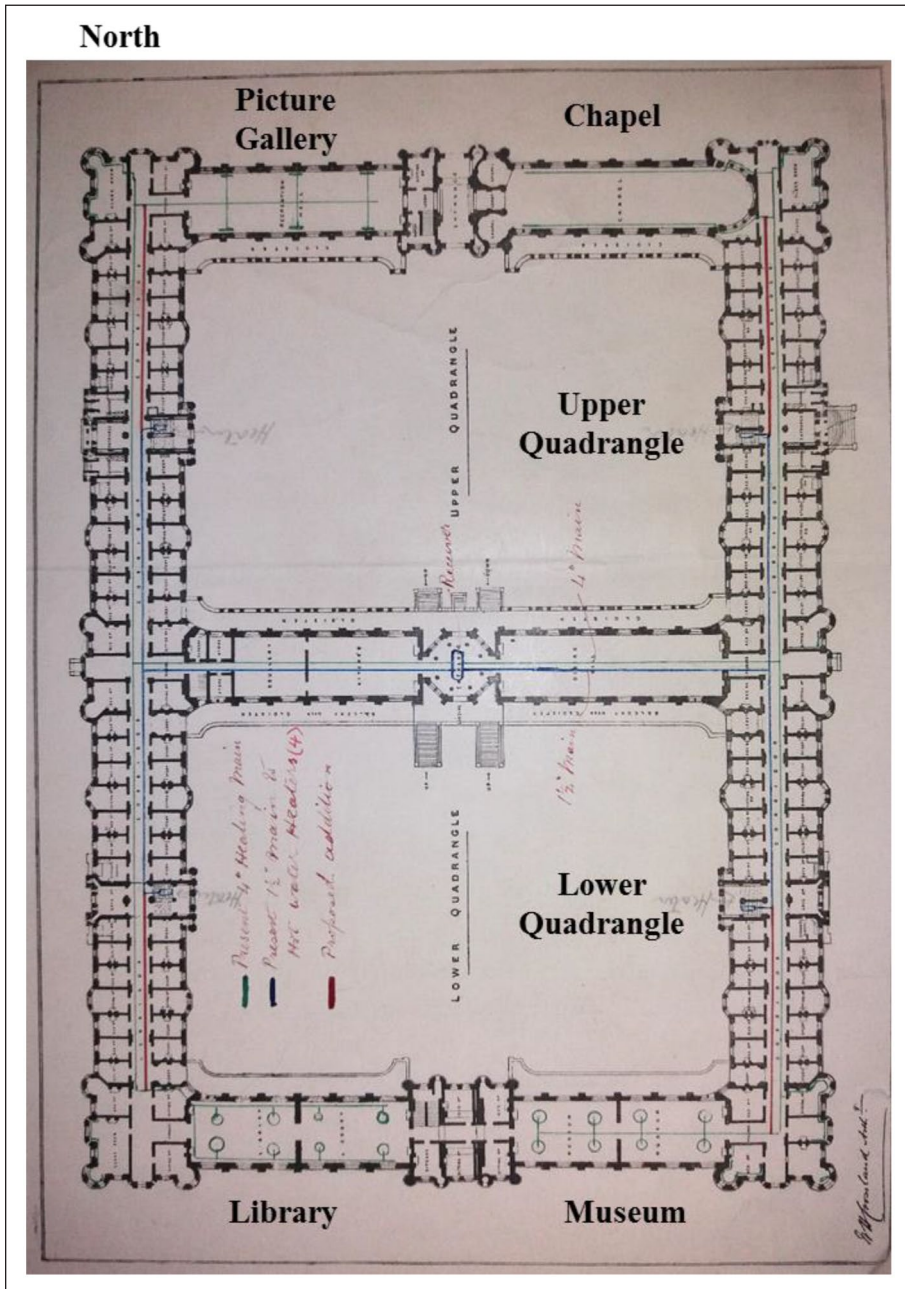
Plan of the Founder's Building, showing heating system and main rooms (source: RHC AR 510.4 Archives, Royal Holloway University of London, with authors' additions).
